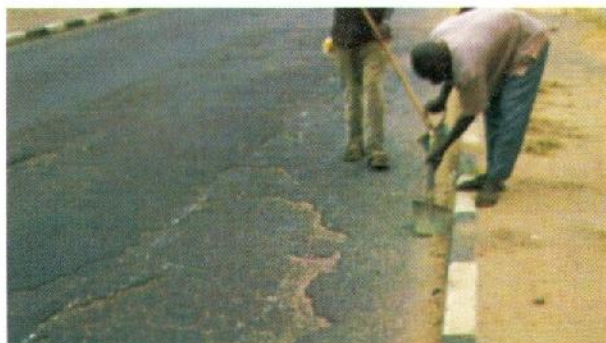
Cleaning surface of pavement with shovel before overlay activities
